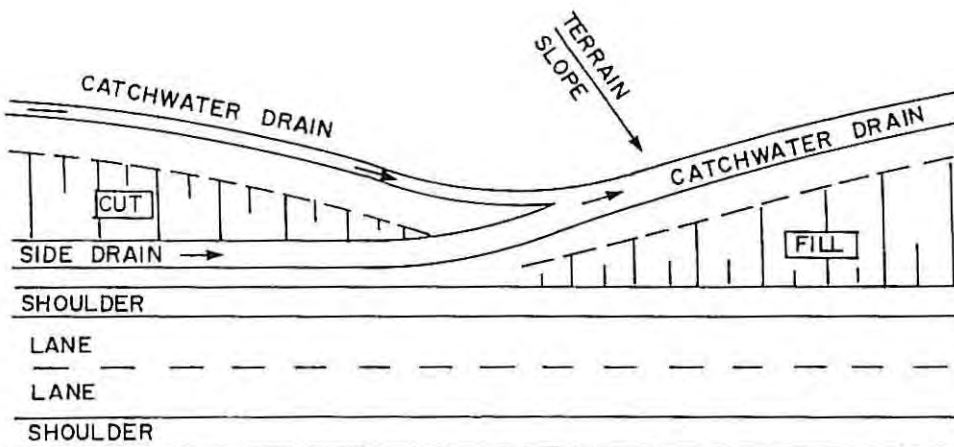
DRAIN LAYOUT AT TRANSITION FROM CUT TO FILL
